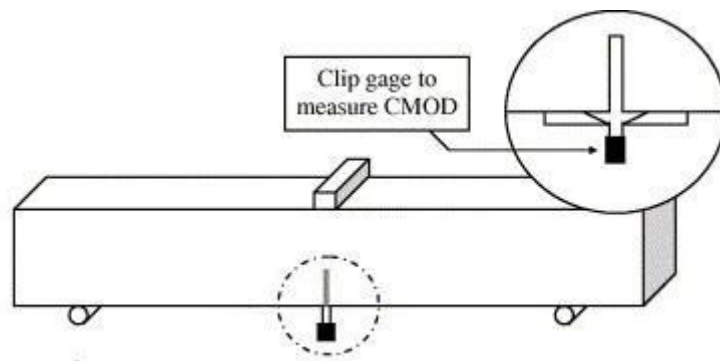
Typical specimen and testing arrangement for three-point bending test
